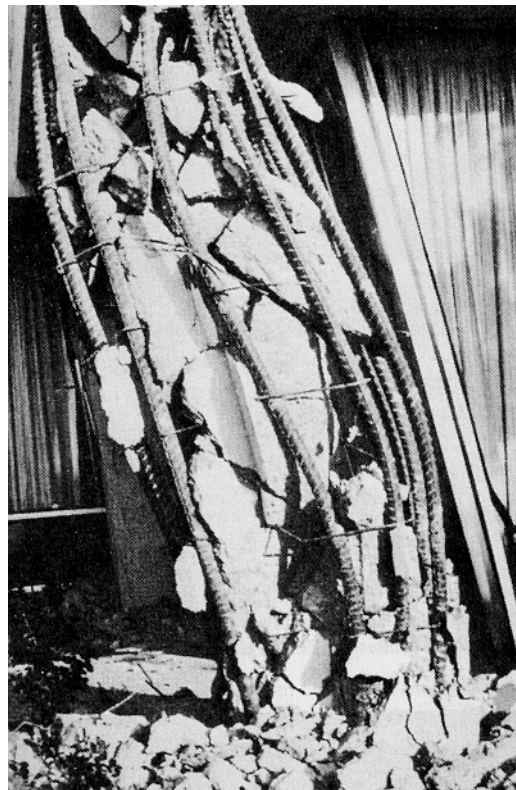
COLUMN FAILURE CAUSED BY LACK OF TRANSVERSE REINFORCEMENT
